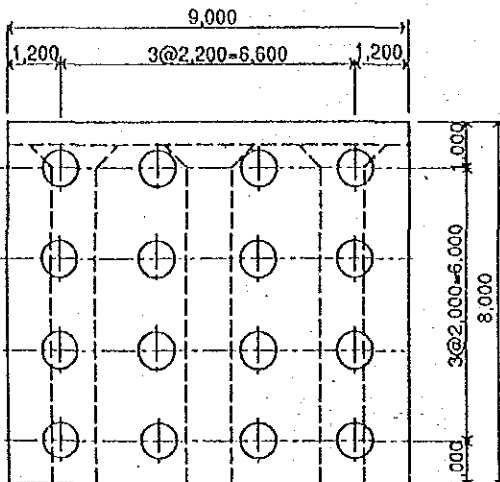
PILE ARRANGEMENT FOR TYPICAL RETAINING WALL
